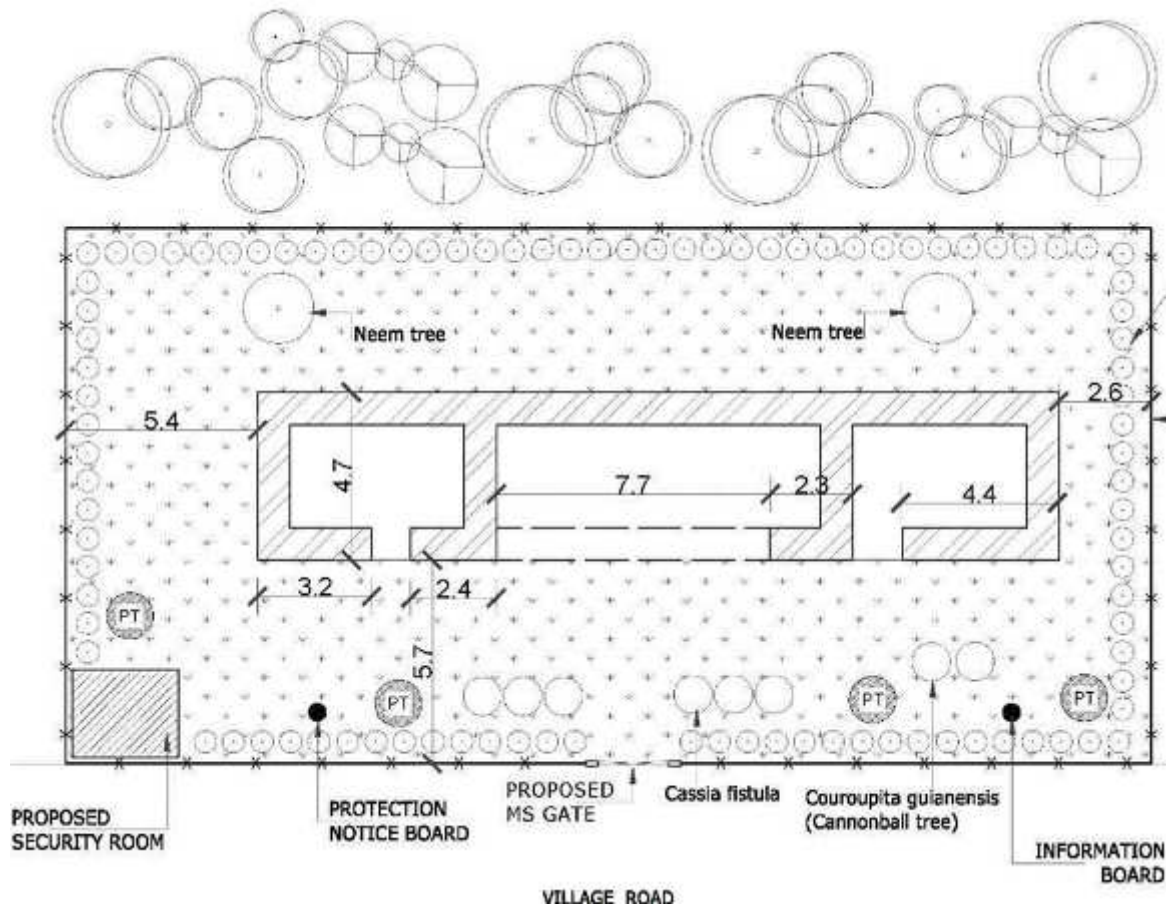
(d) Proposed site plan for subproject components – Maruthupandiyar fort
